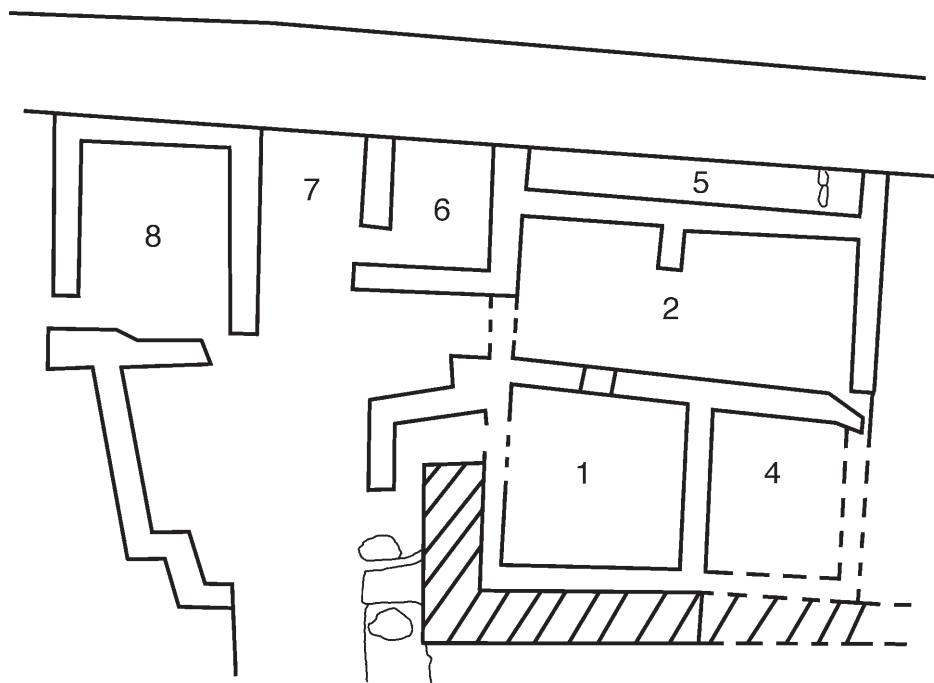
Farmhouse no. 49. Plan of the third building phase.
